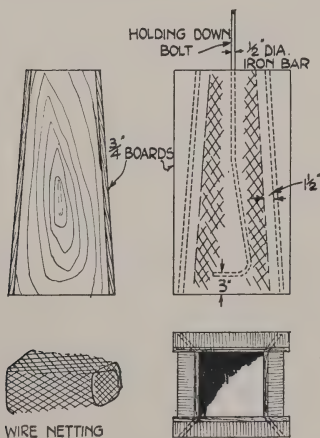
Concrete mould, showing wire netting reinforcement.
